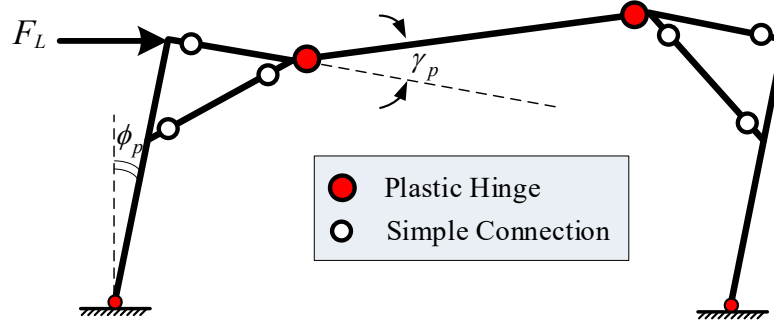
MKF desired collapse mechanism (single-storey one-bay frame shown for simplicity).
